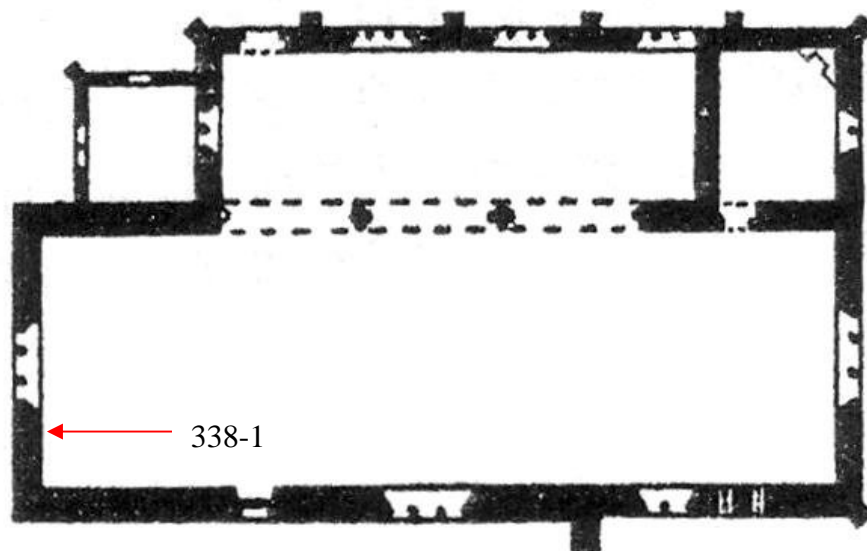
Sampling location in Woodham Walter church. Note that this plan only shows the ground floor of the church. The sample was collected from the second stage of the church in the clock chamber (RCHME, 1921, 270).
